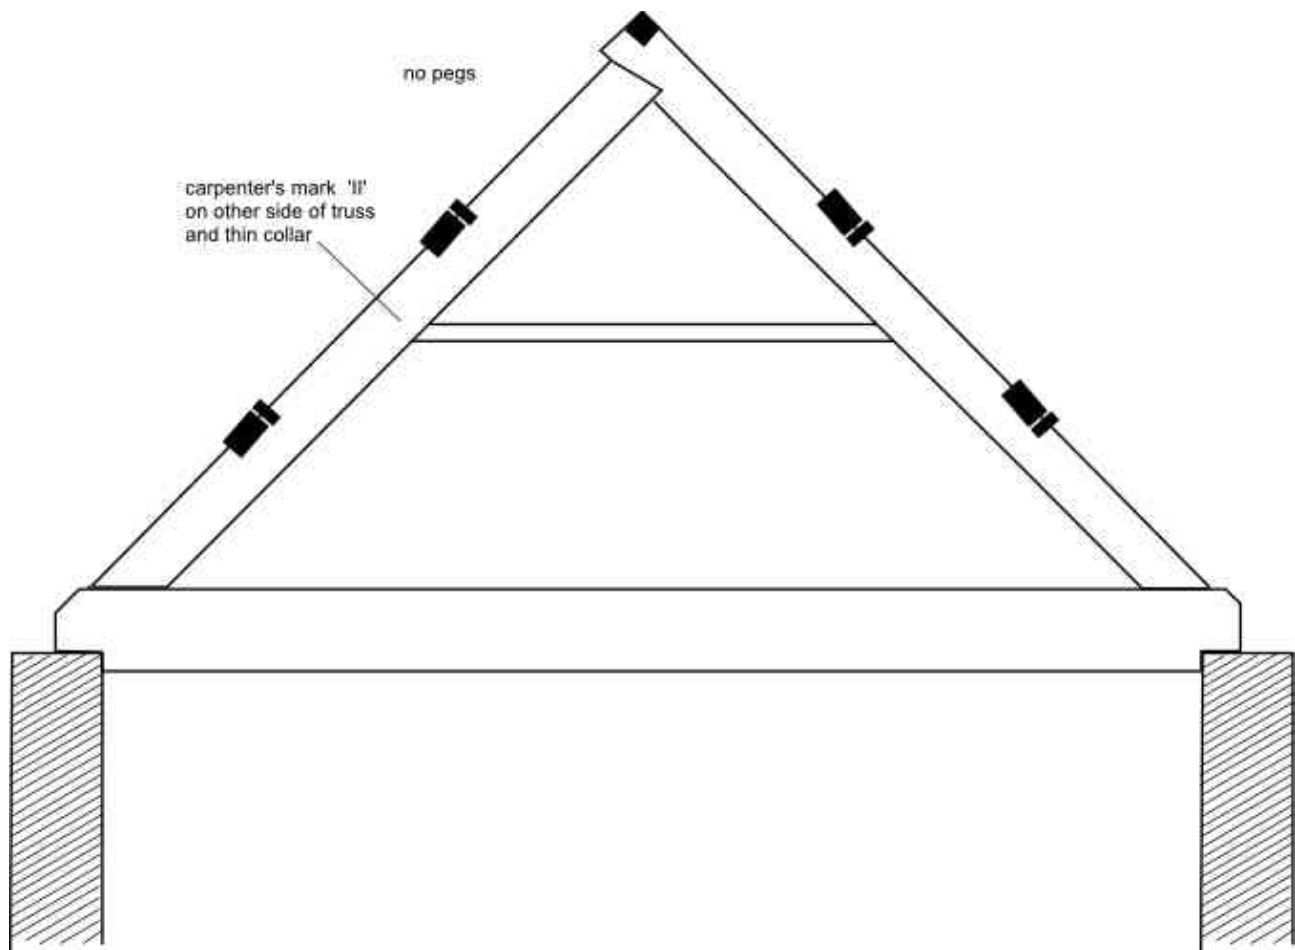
Sketch sectional drawing of the barn roof truss II, viewed from the W.
